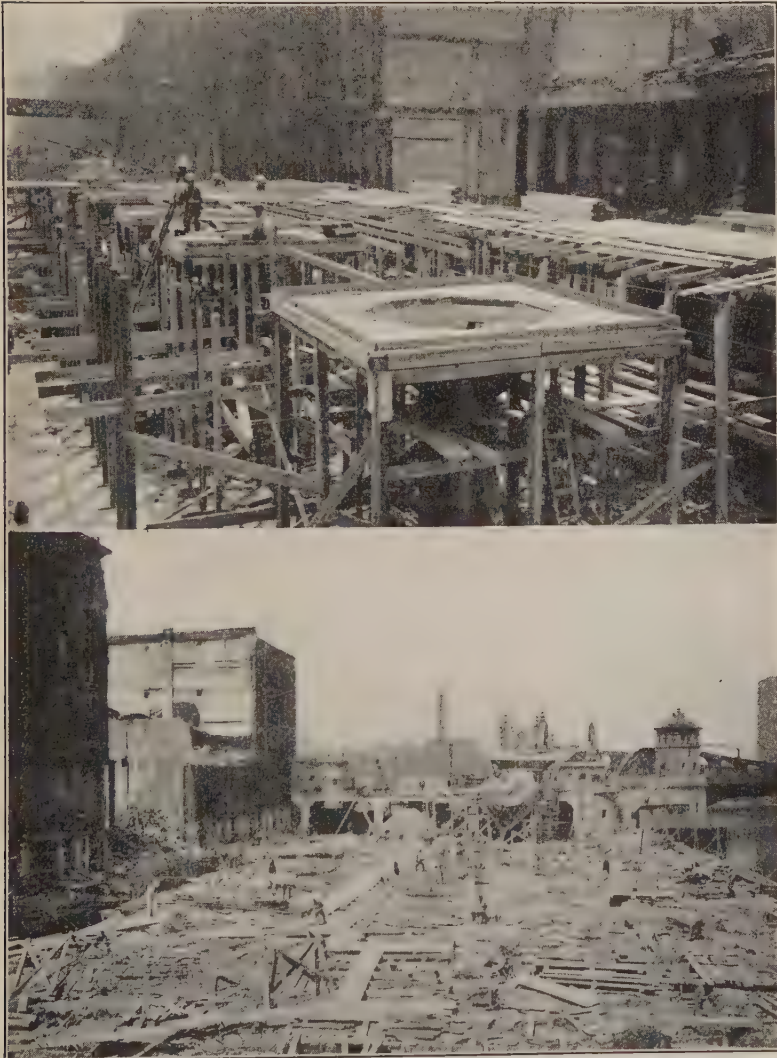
Construction views on Wacker Drive improvement, Chicago, Ill.
